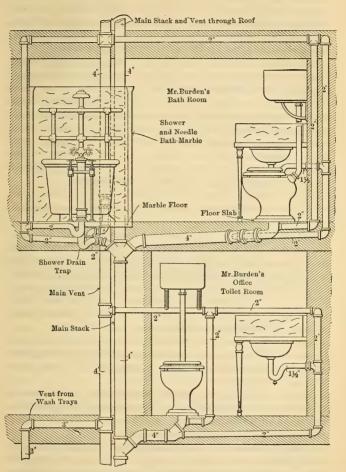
Plumbing in Bath Room and Office Toilet Room of the Burden Residence.
